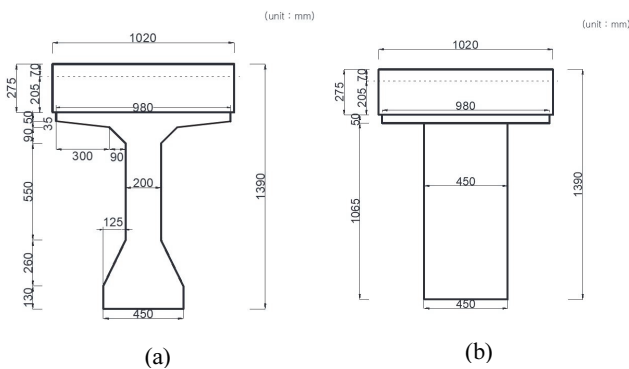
Section of PSC beam girder for evaluation : (a) center section ; (b) support section
